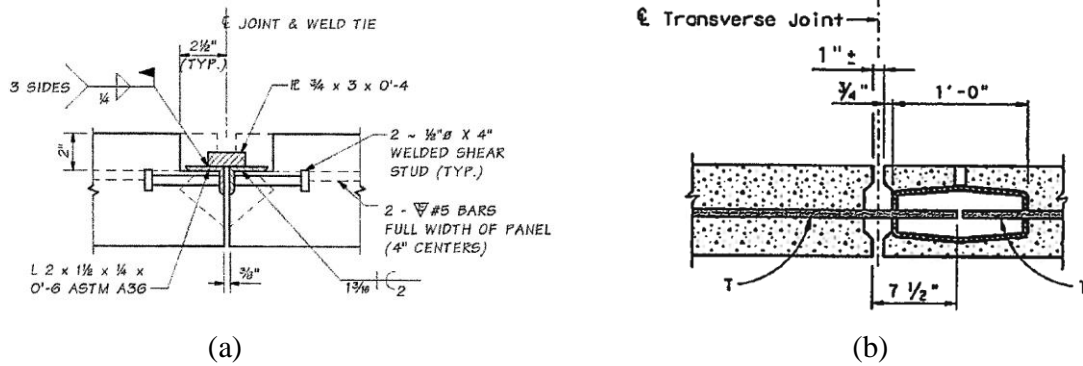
Two types of mechanical connectors: welded connection detail [57] and grouted HSS pocket connection [58]
